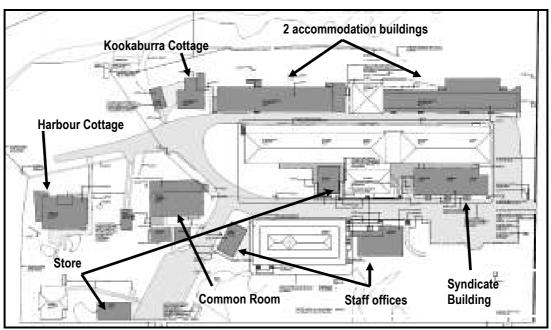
Existing site plan showing buildings to be demolished. Source: Brewster Hjorth Architects
